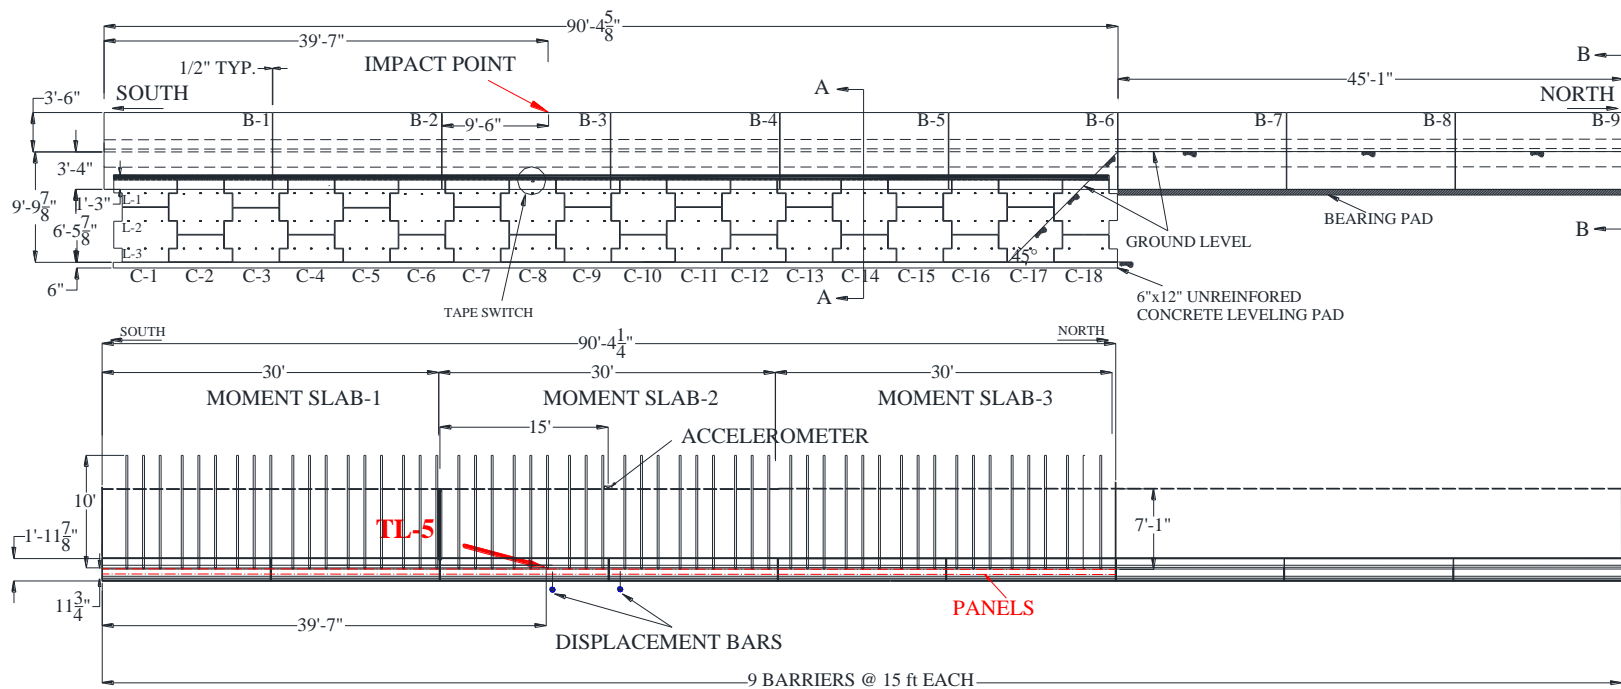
Overall layout of the TL-5 MSE wall test installation
